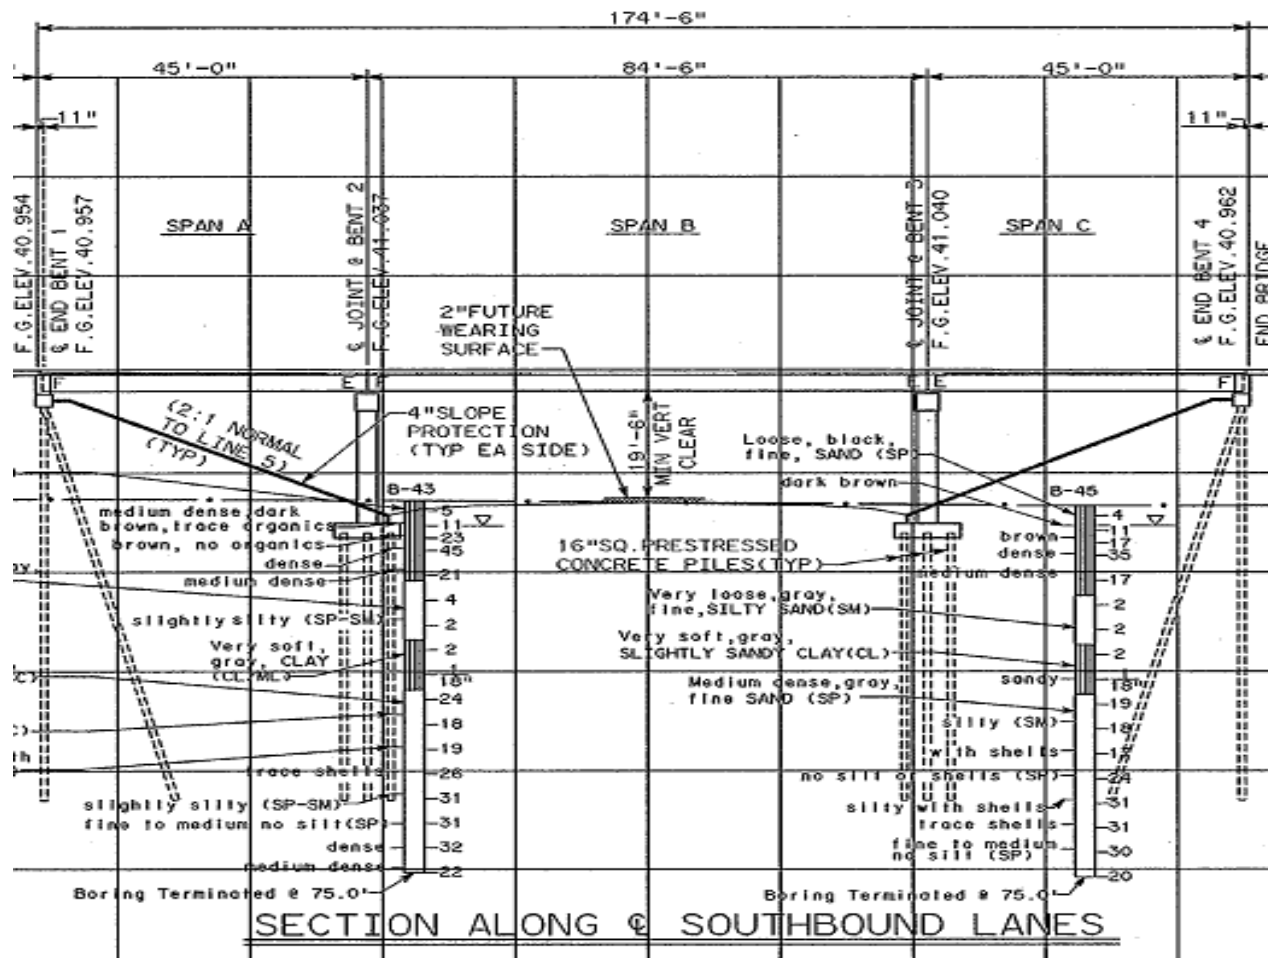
Elevation View of Archetype 2 and 3 Bridges
